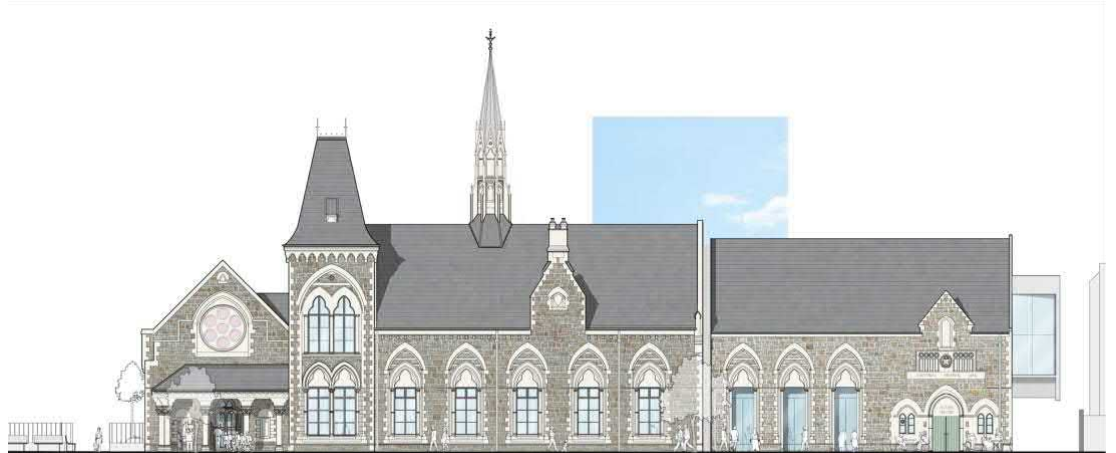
Proposed Rolleston Avenue (east) elevation showing the proposed slot and new opening within the Centennial Wing (Source: Athfield Architects)
